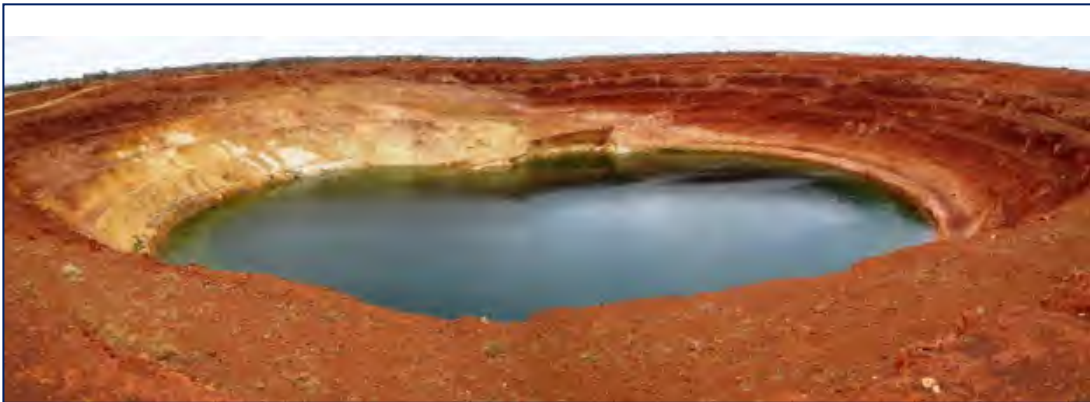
WQS East Wall Instability December 2011 view looking south (POBA 2012 Plate 2)
